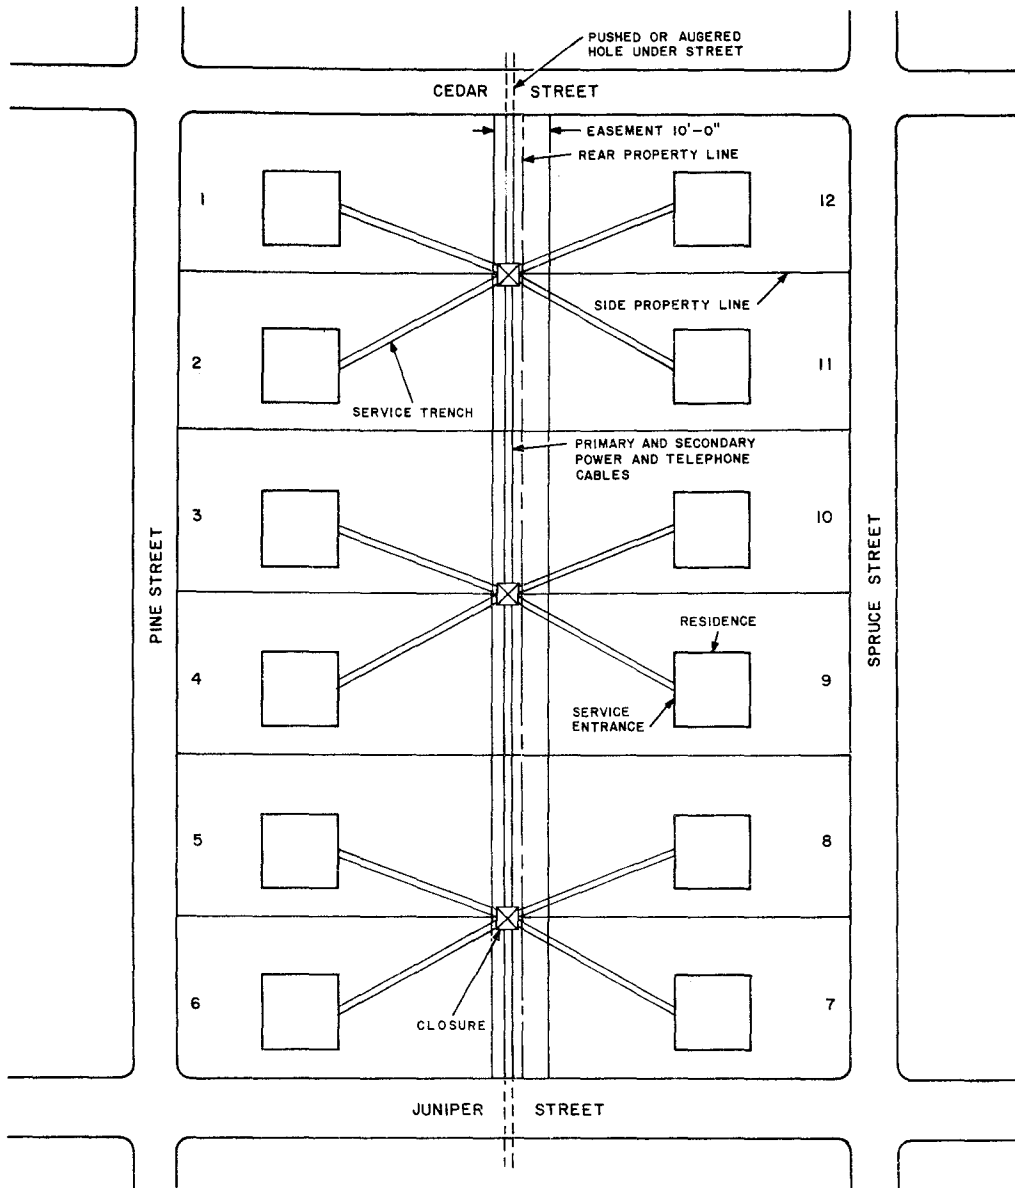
Typical Plan View of Main and Service Trenches in Rear-Lot Buried Installation
